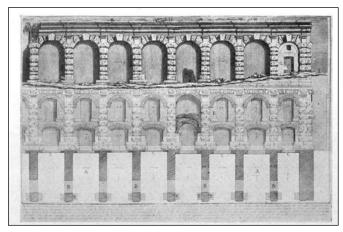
reconstruction of the Elevation and Plan of the western substructures of the Temple of Claudius (G. B. Piranesi).
